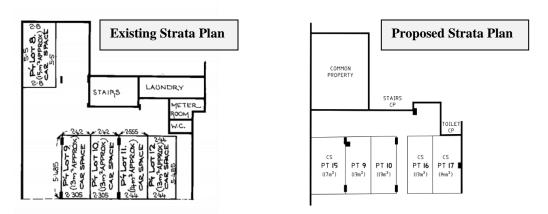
Comparison of the existing Strata plan (Ref No. 11195) & Draft Strata plan (Ref No. 18954) car parking
